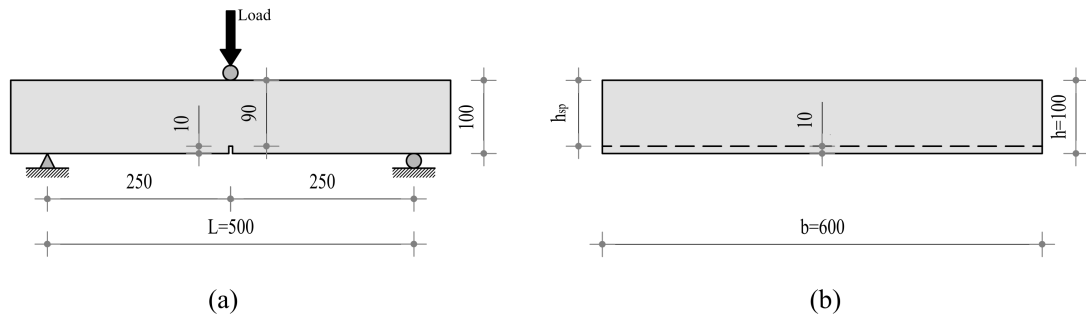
Specimen geometry for the EN 14488-3 [16] test methodology: (a) Front view of the panel specimen; (b) Panel cross section of the specimen (dimensions in mm).
